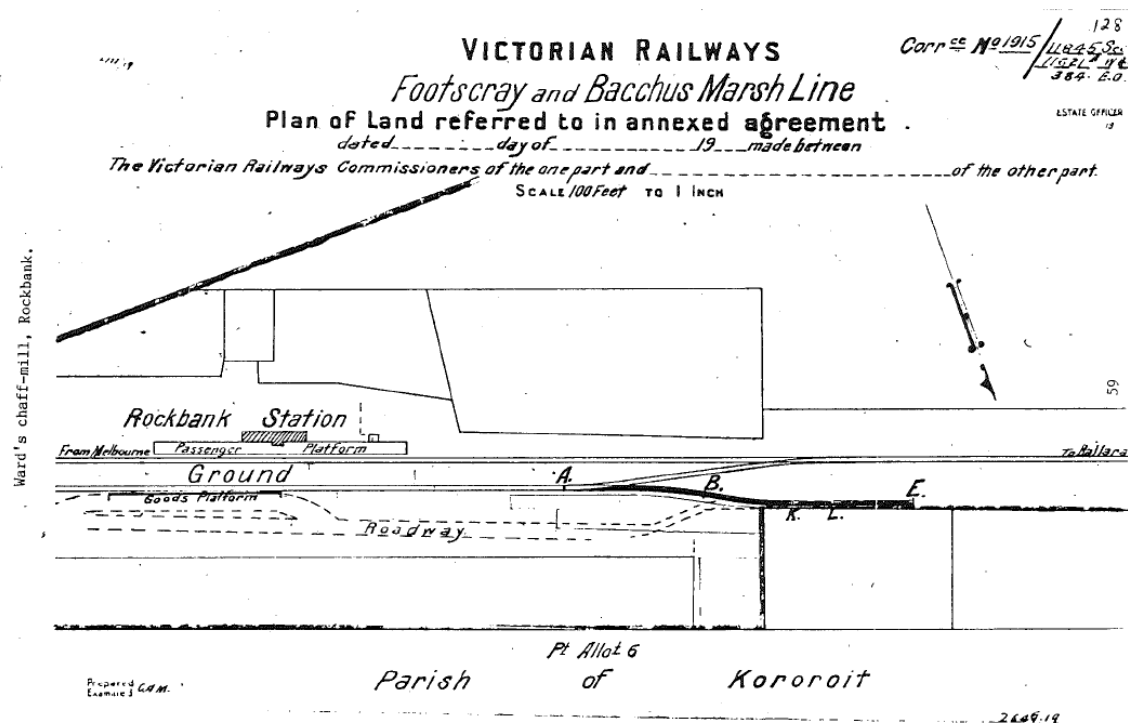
Plan of Rockbank Station and Ward's Chaff Mill siding (VicTrack Sidings section)
